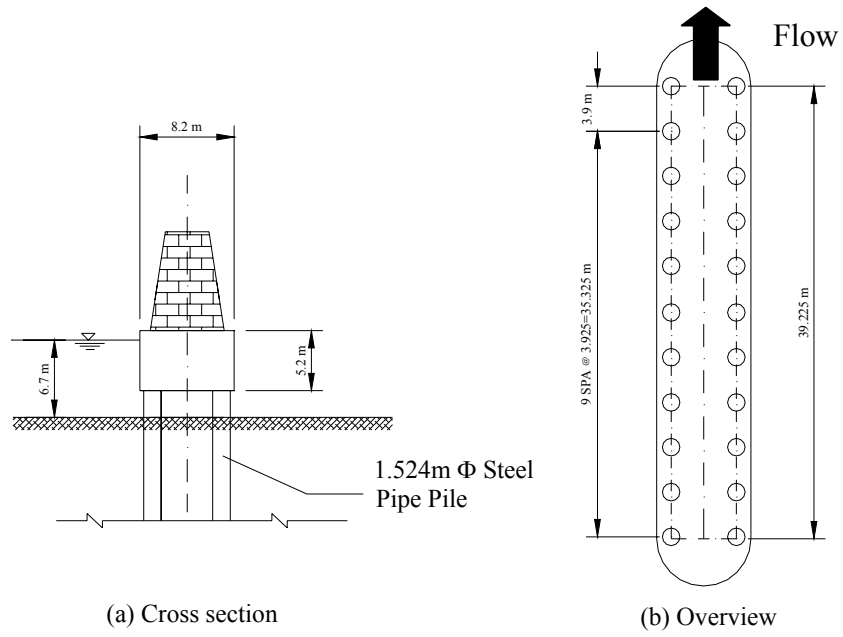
Geometry of the Bascule Pier at the New Sloop Channel Bridge
